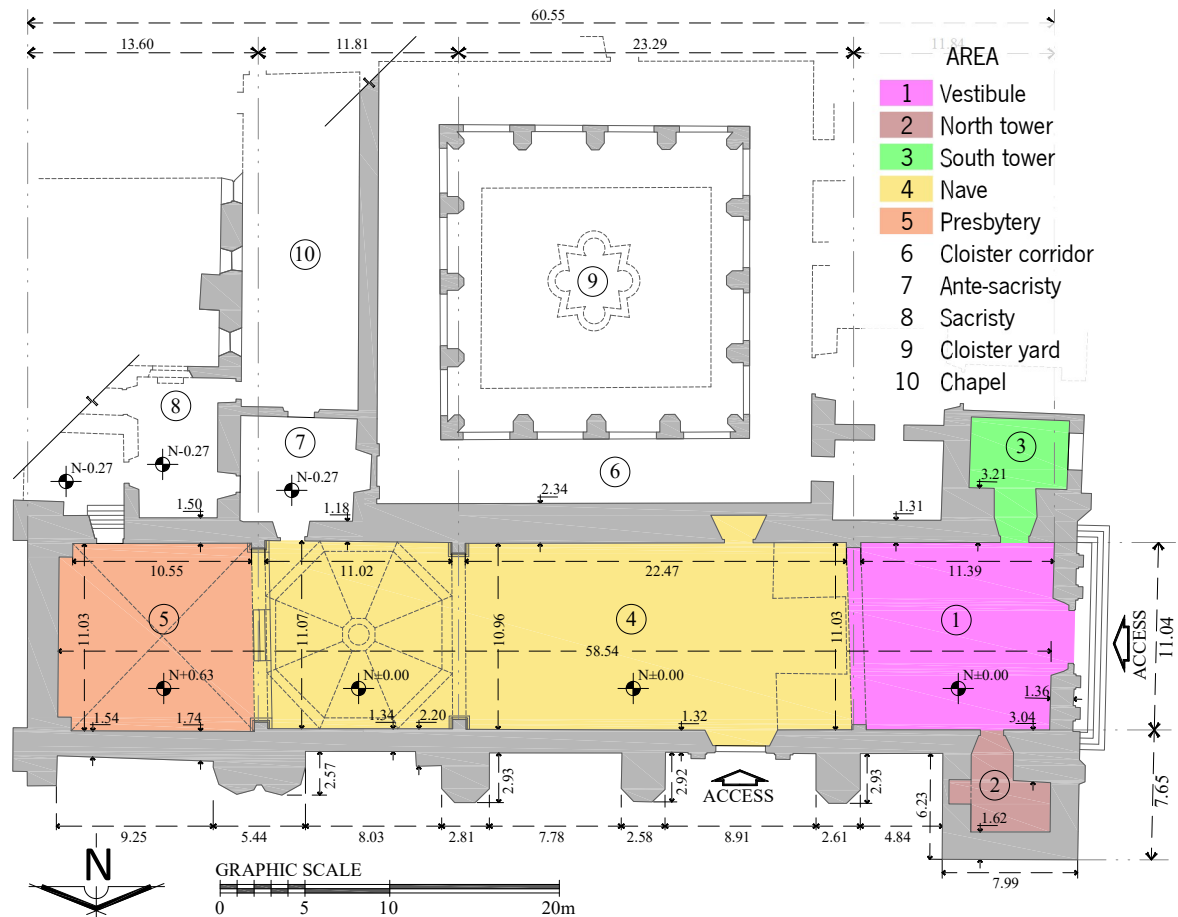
Architectural plan. Nave and cloister of San Agustín church in Morelia, Michoacan, Mexico.
